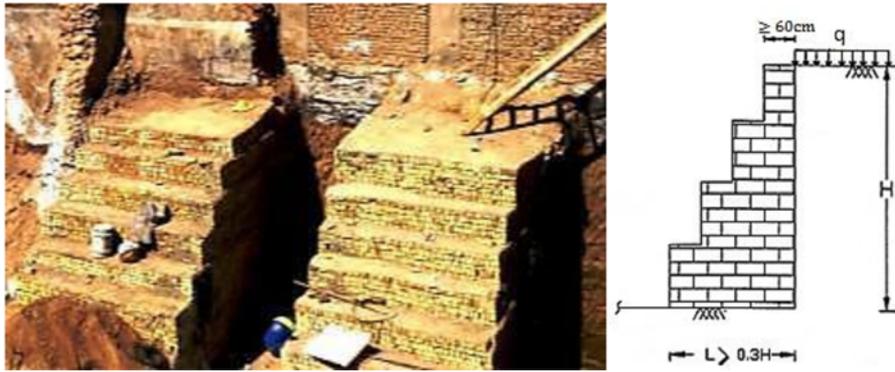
Using the Stair Wall Method as Excavation Supporting Structure
